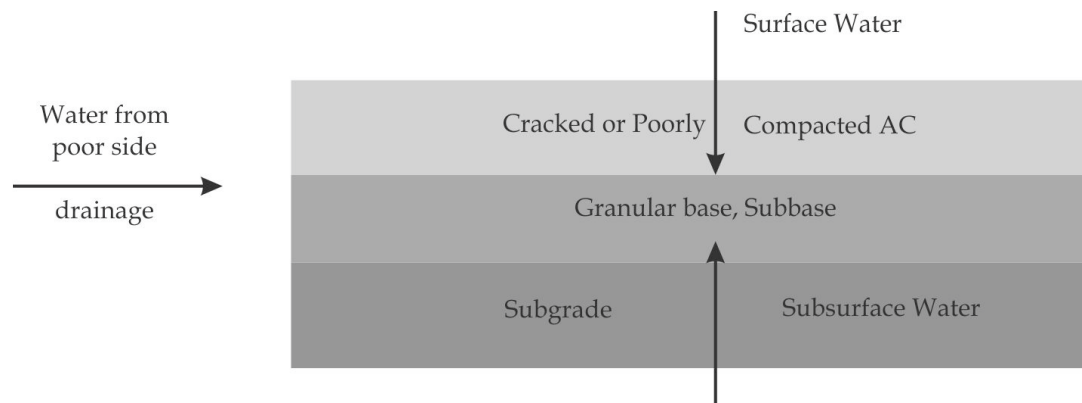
Sources of Water in an Asphalt Pavement (Santucci, 2002)
